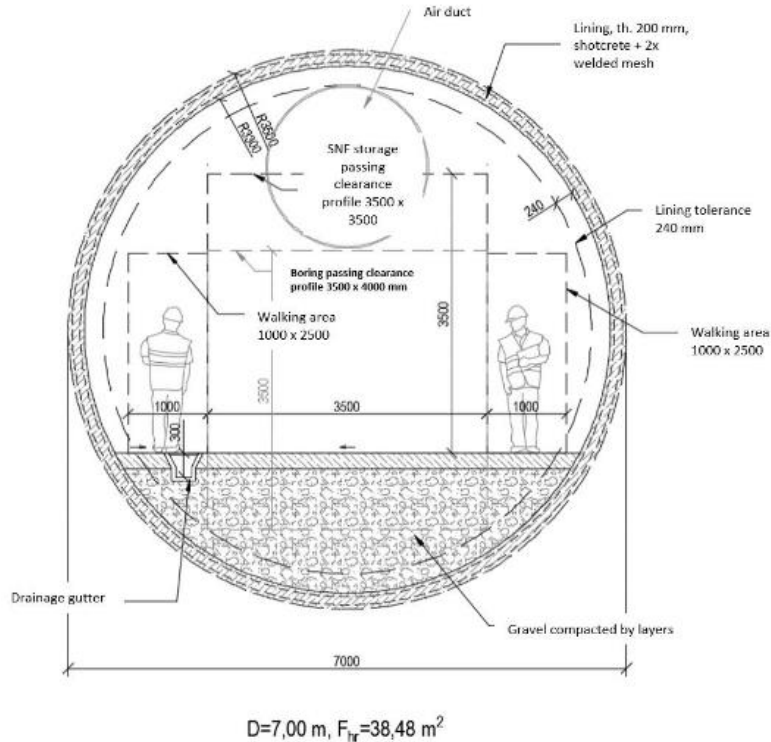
Cross-section of the transfer and extraction tunnels, TBM boring method, design alternative D3 - HD, M for horizontal disposal. Note that a significant part of the cross-section area is occupied by gravel. Authors of this review are not aware if the gravel levelling is planned to be removed before closure. If it is intended to be left in the repository, its impact on the groundwater flow and chemistry is an issue to be assessed.
